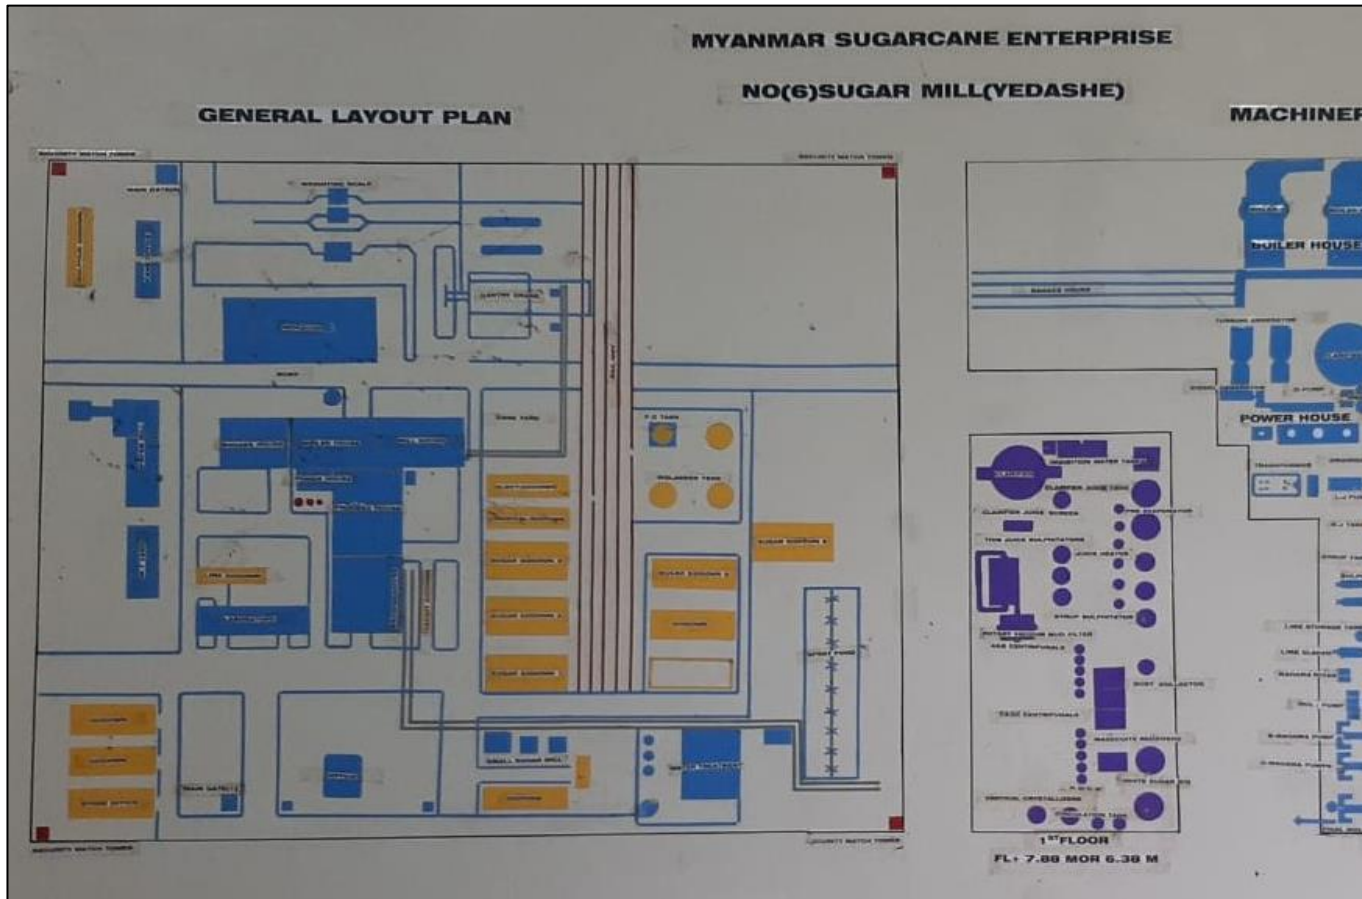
Master Plan Layout Design of No. 6 Yedashe Sugar Mill Production
